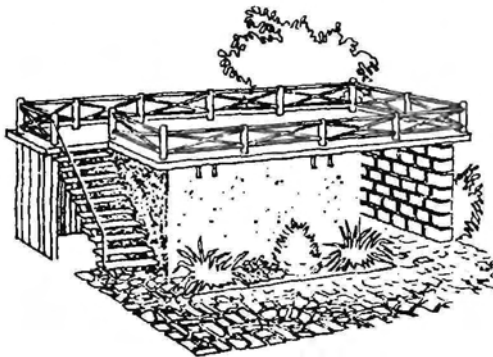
Permanent Exterior Ground Level Shelter. This design provides excellent fallout, thermal, blast, and storm protection for areas where underground shelters are not practical. (After Above-
